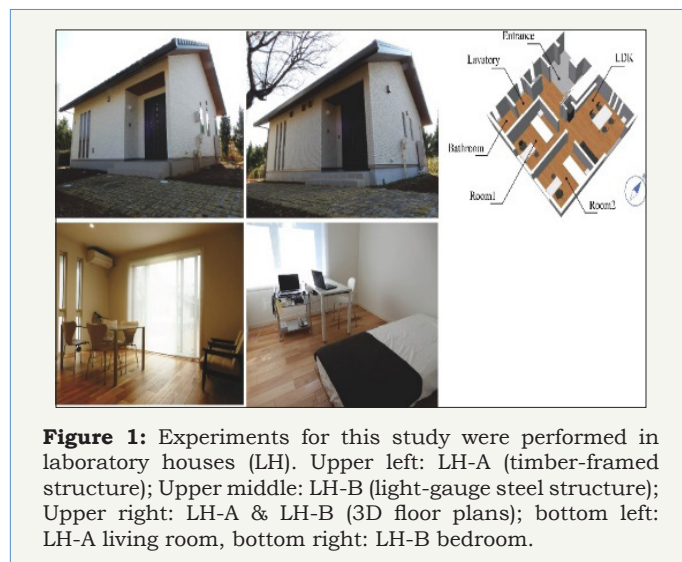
Experiments for this study were performed in laboratory houses (LH). Upper left: LH-A (timber-framed structure); Upper middle: LH-B (light-gauge steel structure); Upper right: LH-A & LH-B (3D floor plans); bottom left: LH-A living room, bottom right: LH-B bedroom.
